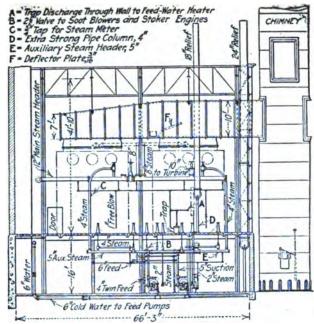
REAR ELEVATION OF BOILER SETTING AND PIPING.
